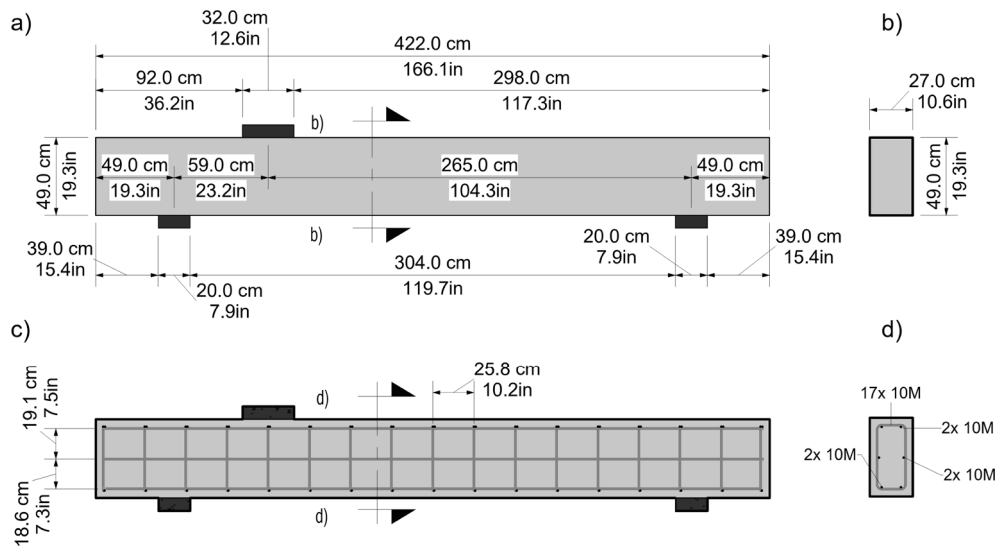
Studied deep beam: a) side view; b) cross-section; c) side view of the minimum distributed reinforcement detailing; and d) cross-section of the minimum distributed reinforcement detailing.
